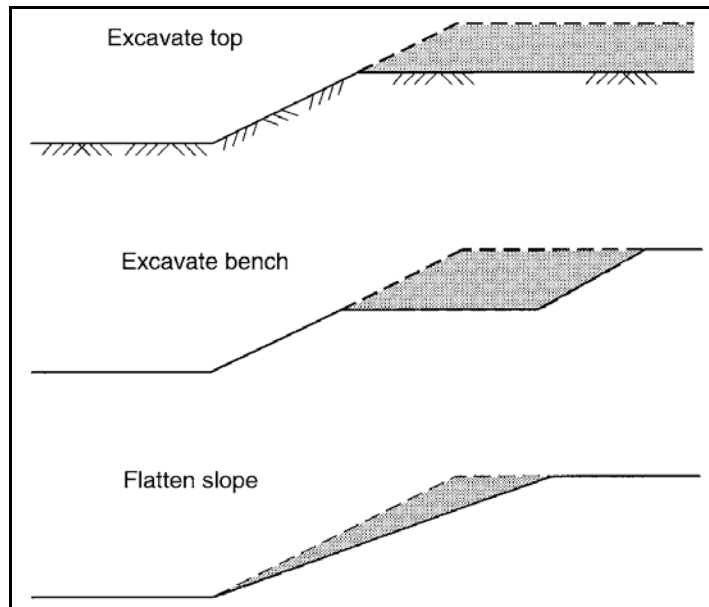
Slope stabilization by excavation (Duncan et al., 2005)
